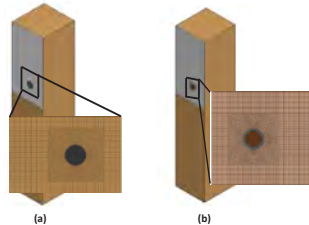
Finite element setup : (a) with galvanized steel dowel, (b) with wood-filled aluminium hollow tube dowel
